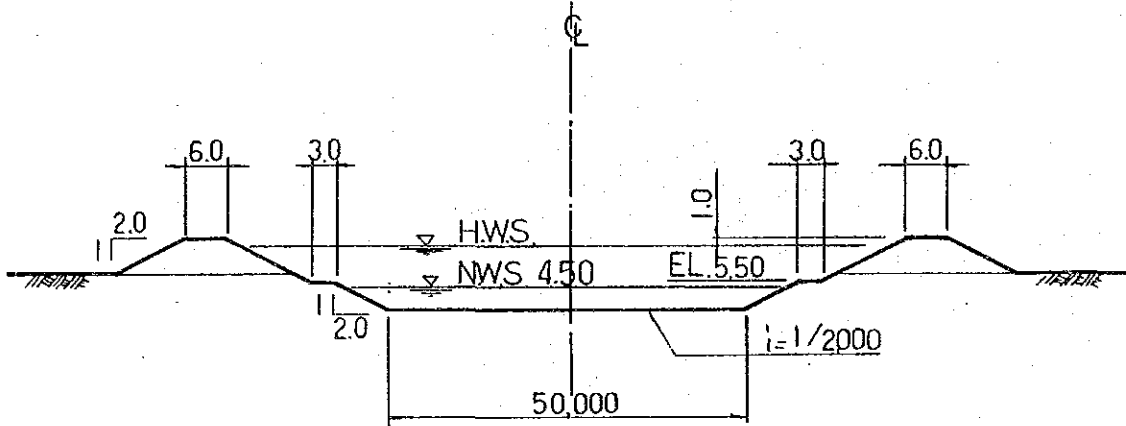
TYPICAL CROSS SECTION OF CANAL (2/2)
